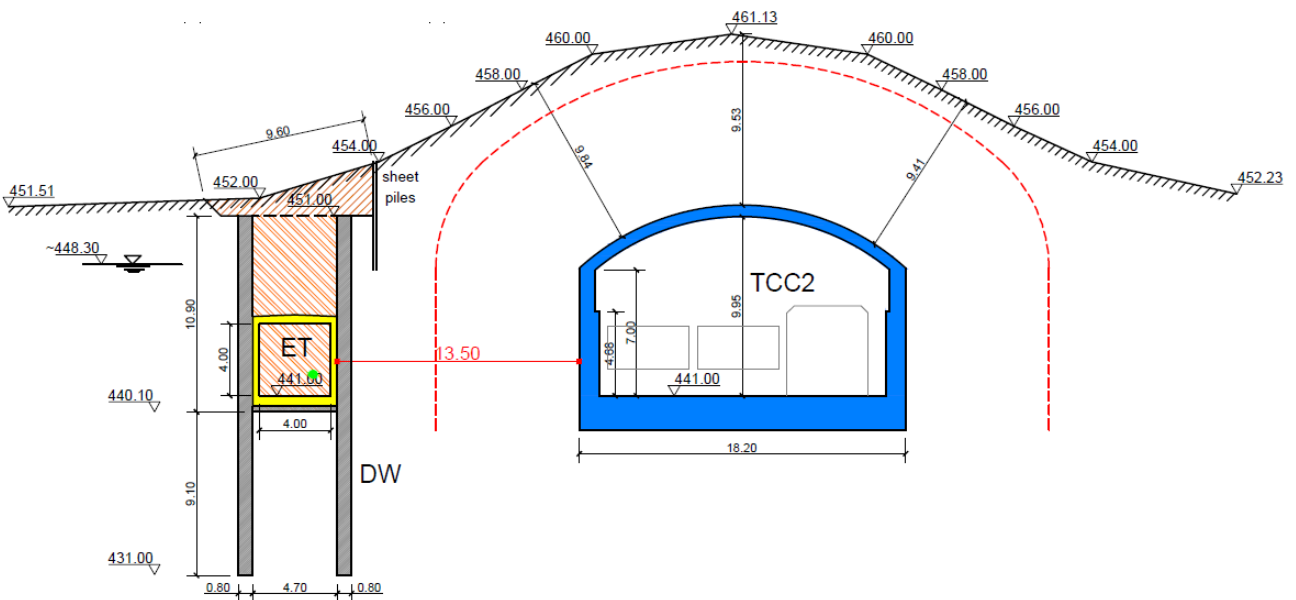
Cross section 6.1. Diaphragm wall are 20m depth.
